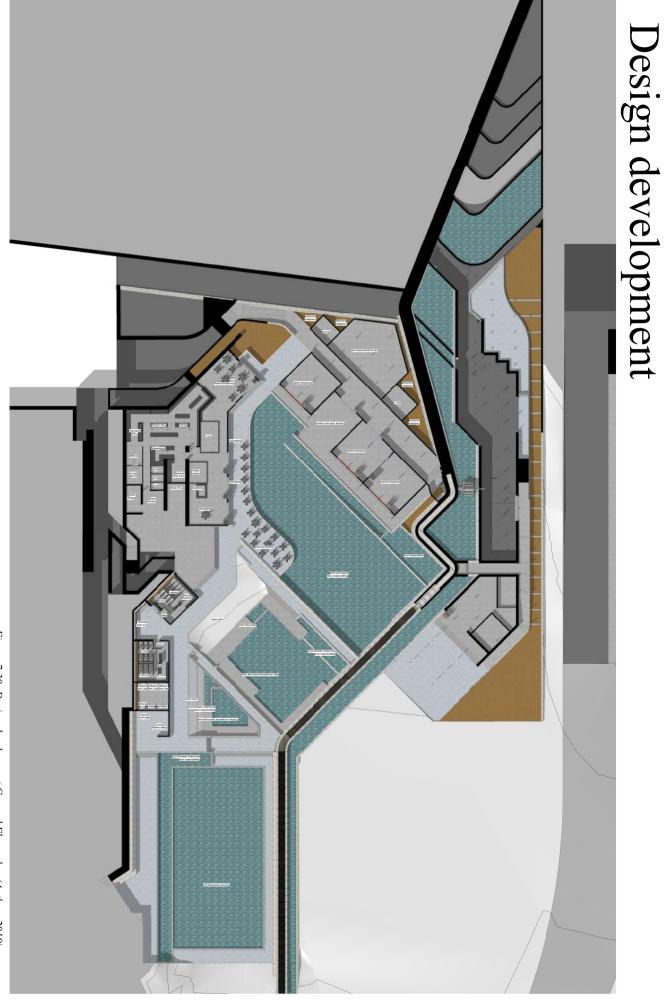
Design development Ground Floor plan (Author, 2019)
